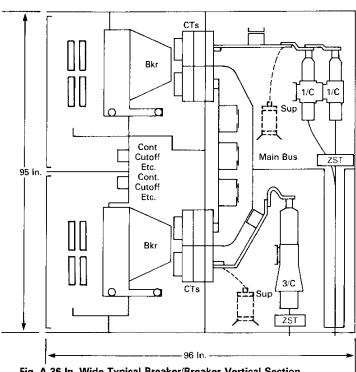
In. Wide Typical Breaker/Breaker Vertical Section
